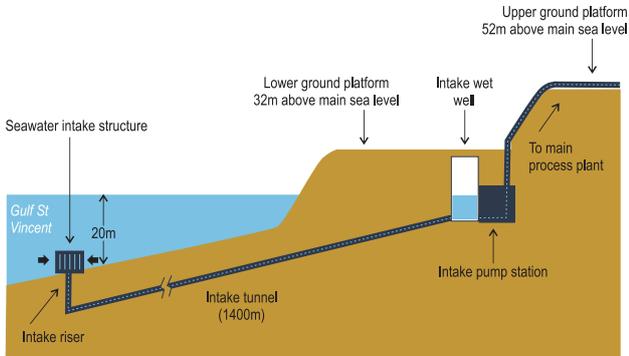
The intake tunnel structure of the ADP. Note that the diagram is not drawn to scale (Aurecon Group).
